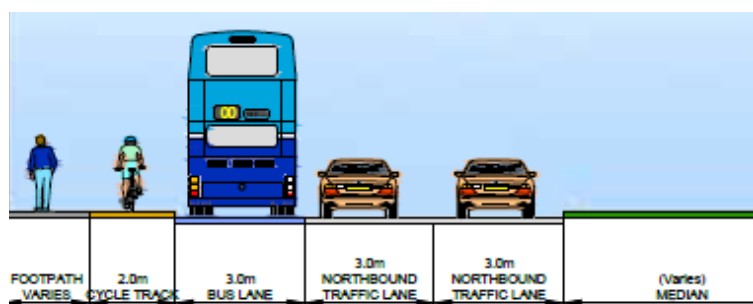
EPR (Option A) Cross-Section on Ballymun Road (Northbound Carriageway)
